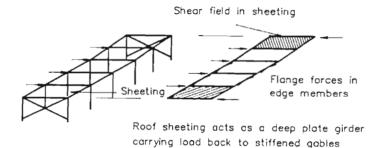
Diaphragm action in a flat roof on hinged columns.
